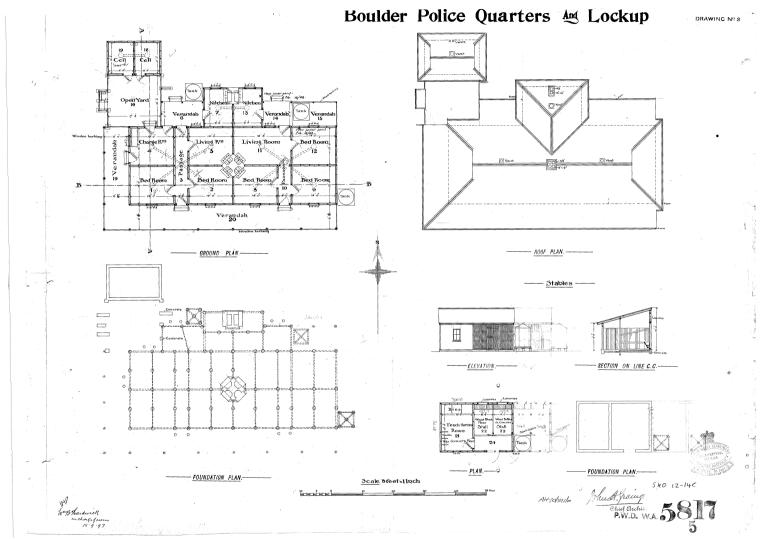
Boulder Police Quarters and Lockup Plans, 1897, Drawing No. 3, Public Works Department WA. Department of Finance Building Records.
